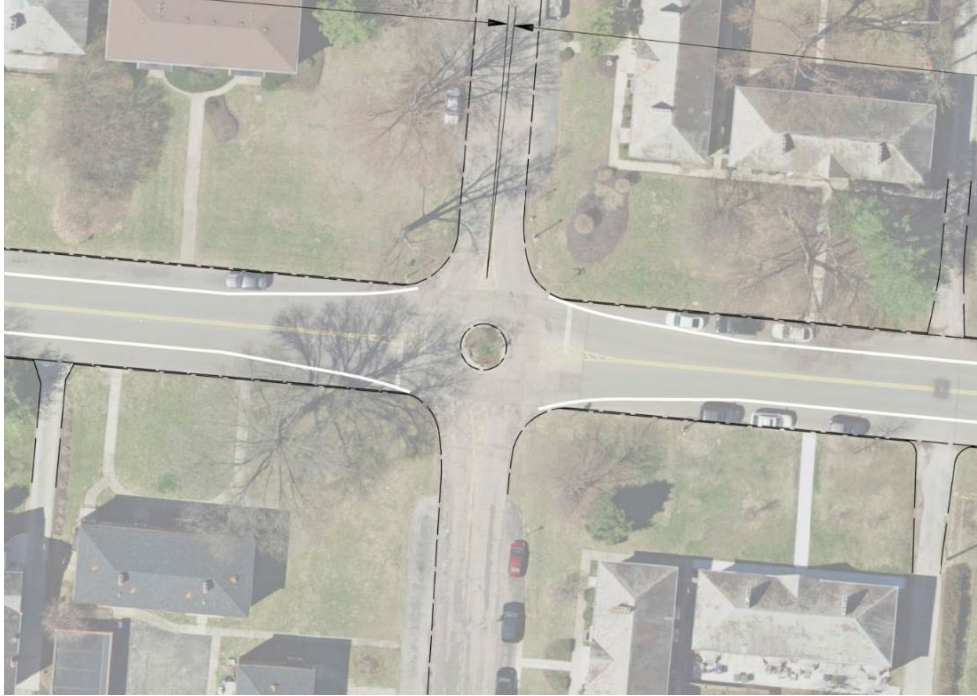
Example of Proposed Pavement Markings on Eastmoor Blvd
